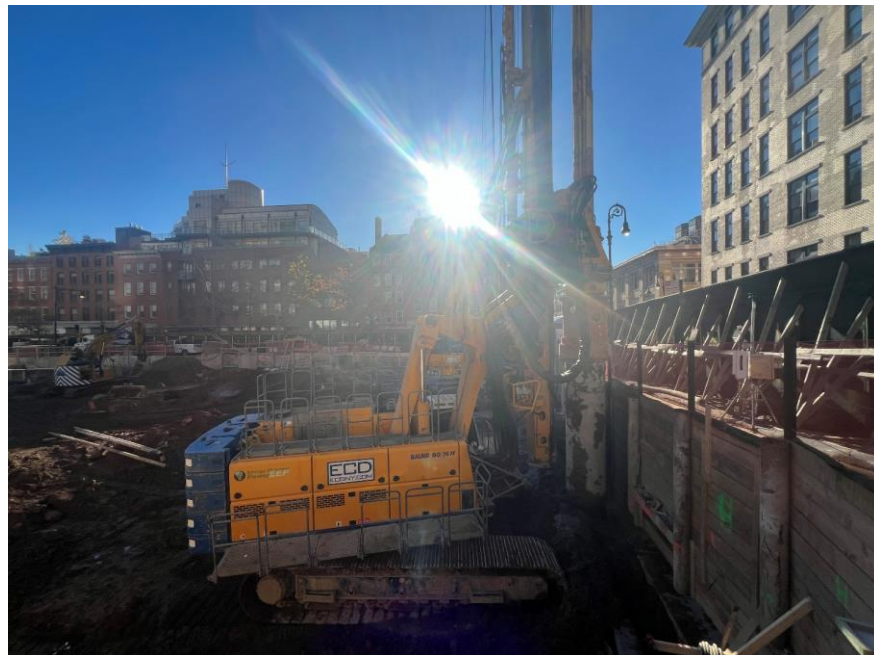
ECD installing a secant pile in the western part of site (facing south)
